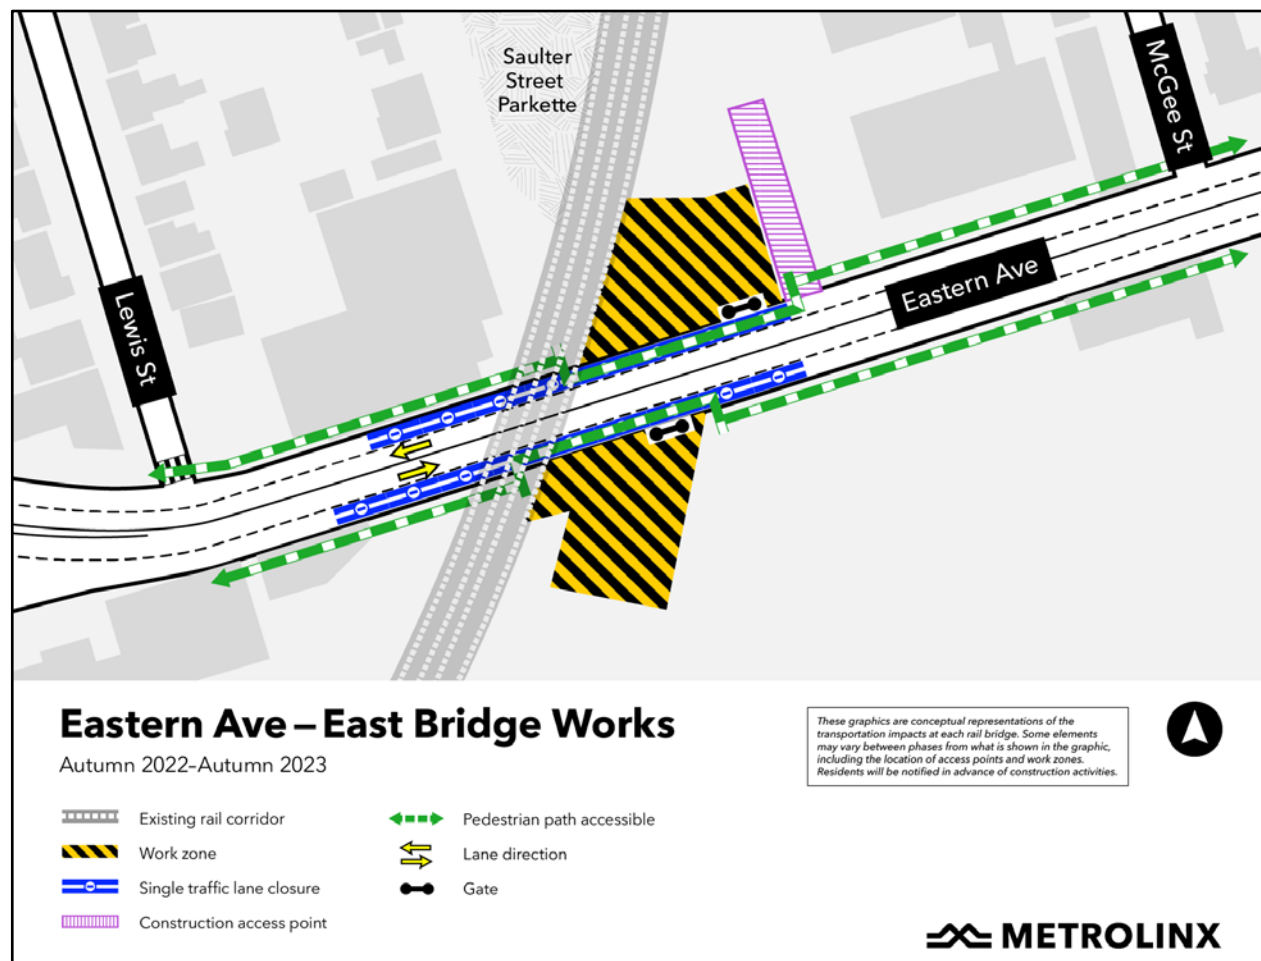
Eastern Avenue Traffic Management during East Side Bridge Structure Works Source: Metrolinx
